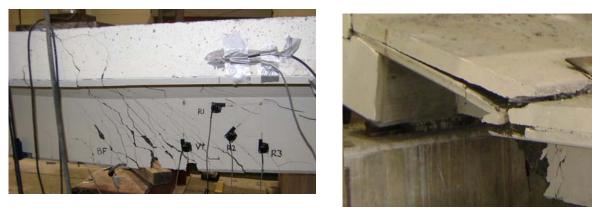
Shear Failure of a) Girder 1, and b) Girder 2
